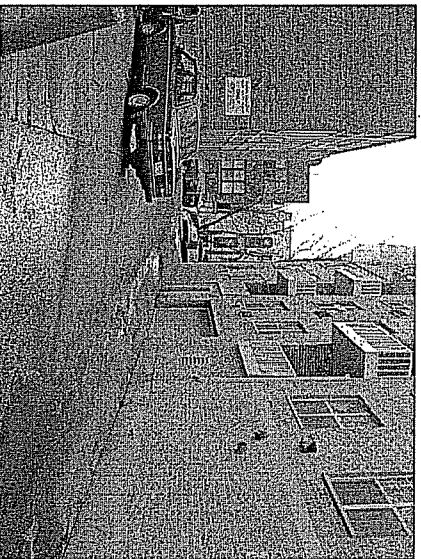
View looking south across Langdon Street (Existing Hillel building)
